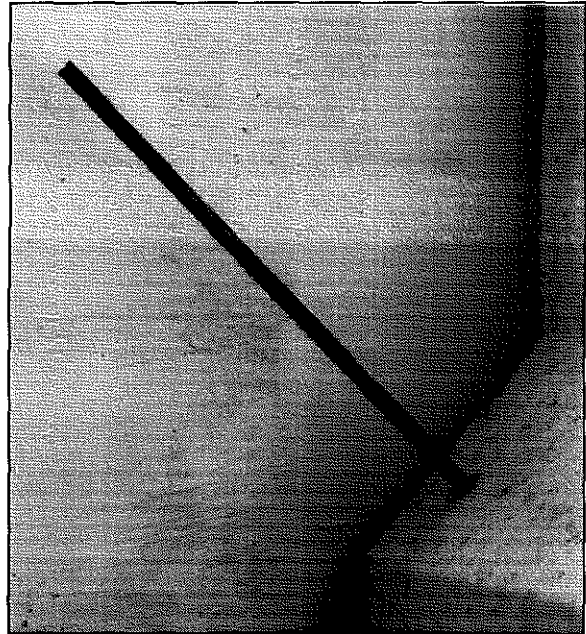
Diaphragm Anchor Bar in Place at the Abutment.
